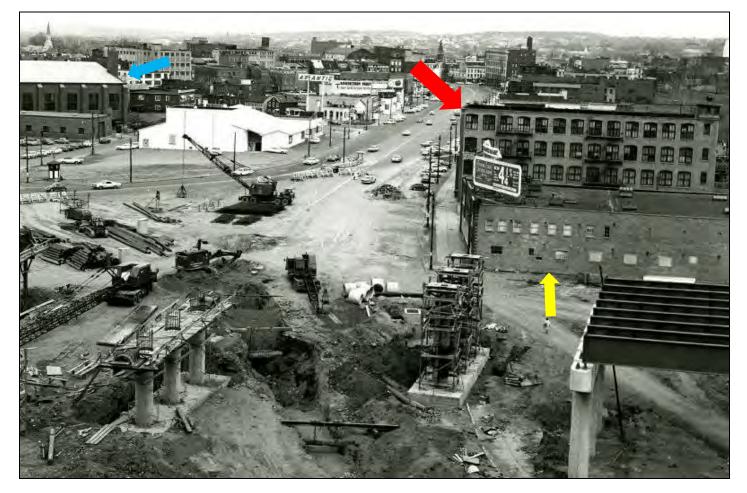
A 1961 image of the construction of I-890 and its eventual cloverleaf into Erie Blvd. This was taken from G.E. at its main entrance looking northeast up Erie Blvd. towards the intersection with State Street and downtown Schenectady. G.E. Building 32 is to the right (red arrow). G.E. Building 33 stands in front of Building 32 (small yellow arrow). The National Guard Armory is across the street and the far upper left-hand corner (small blue arrow). This extant building held many civic and military meetings as did Building 32.(Photo courtesy of Schenectady Historical Society).
